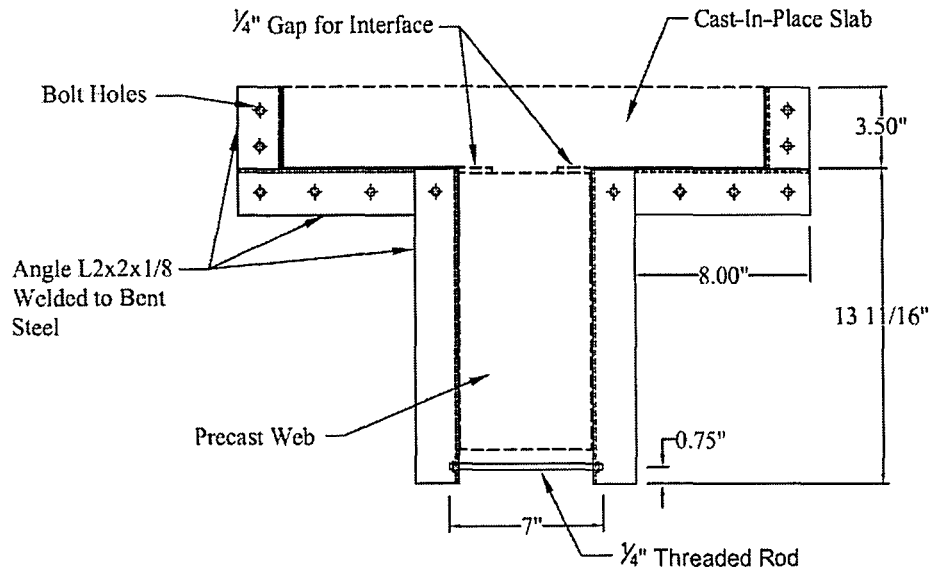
Cross-Section View of the Formwork at End of Beam
